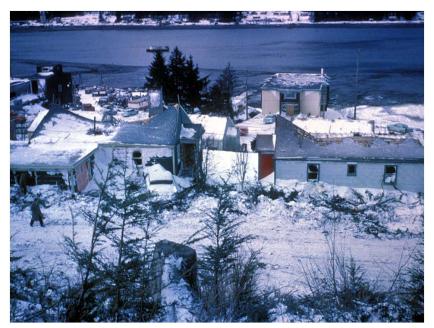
View of Behrends Avenue with Gastineau Channel in the background – collapsed roofs due to overpressure and impacts of trees. The back-walls are not damaged.
